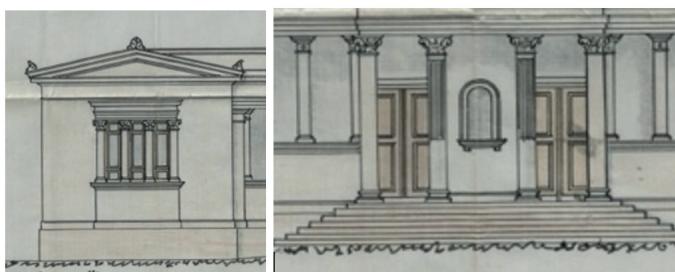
Detail from the Elevation Drawing of the Greek Boys' School in Alaçatı
